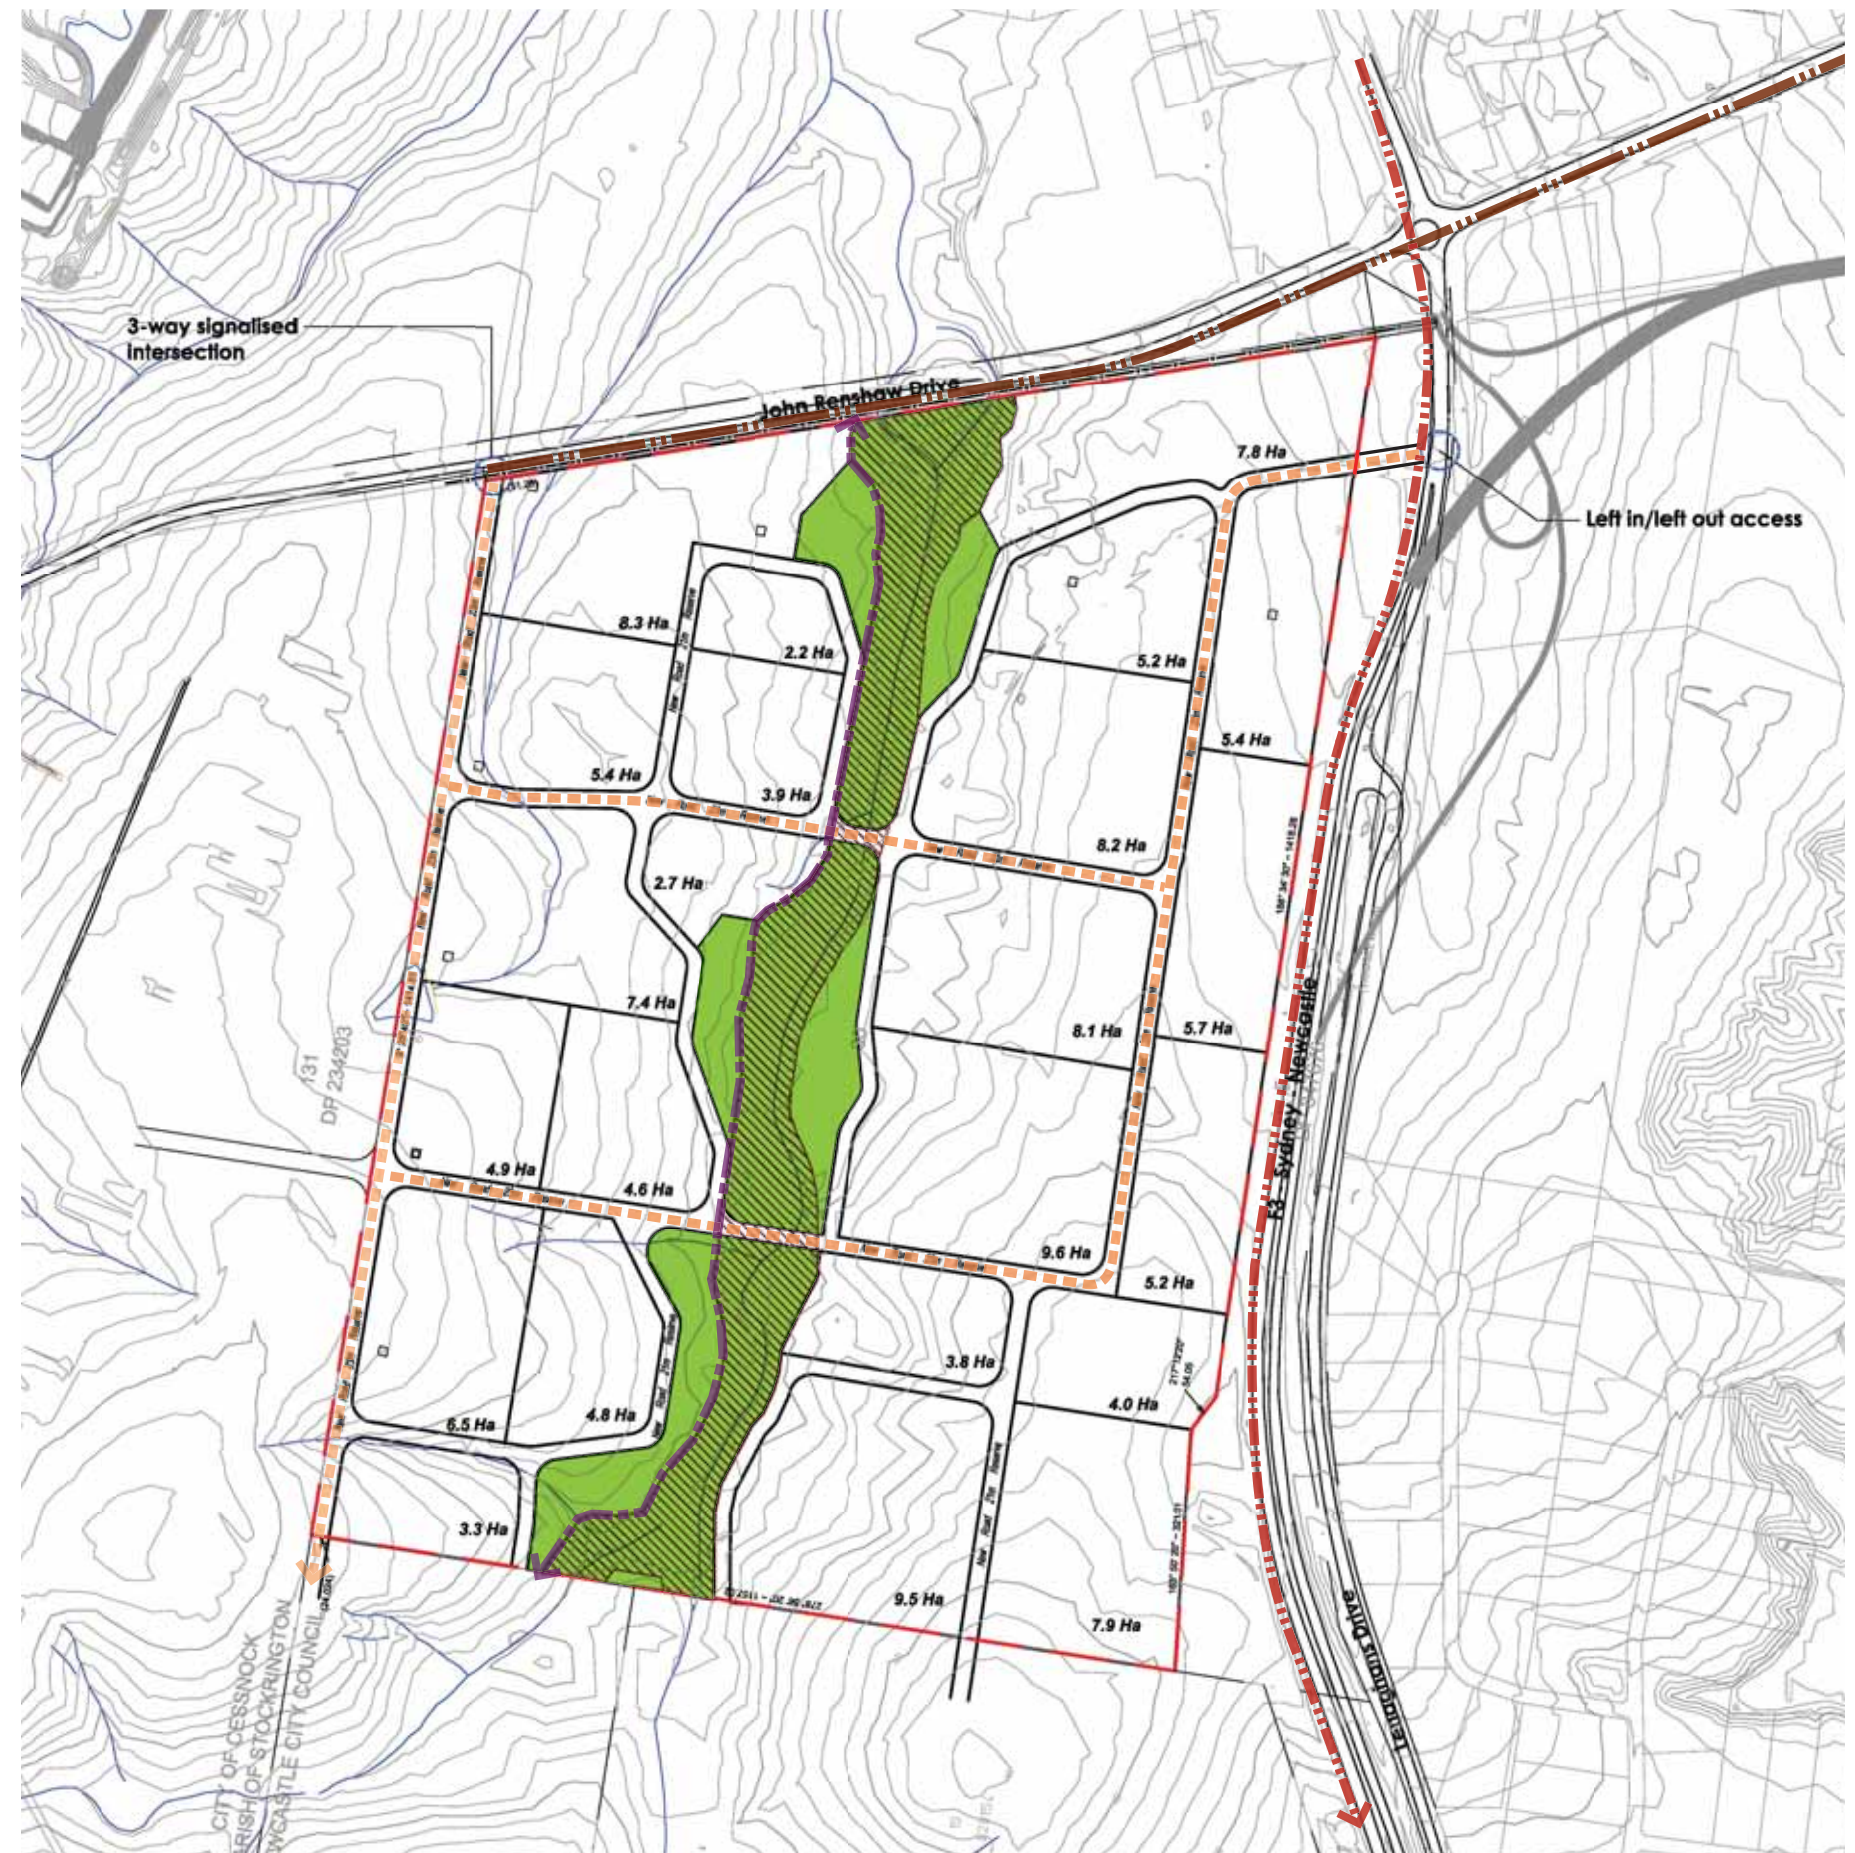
Proposed Pedestrian and Cycle Plan
